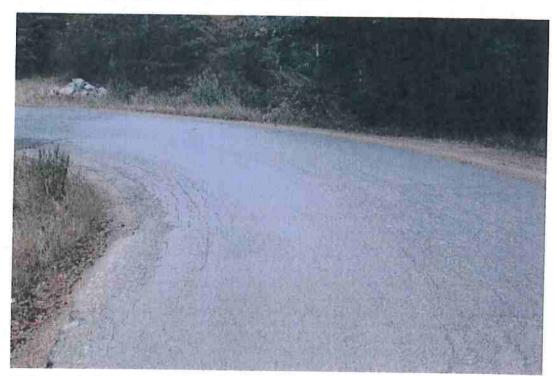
Mile 0.9: 24-ft road width with 2-ft shoulders.
